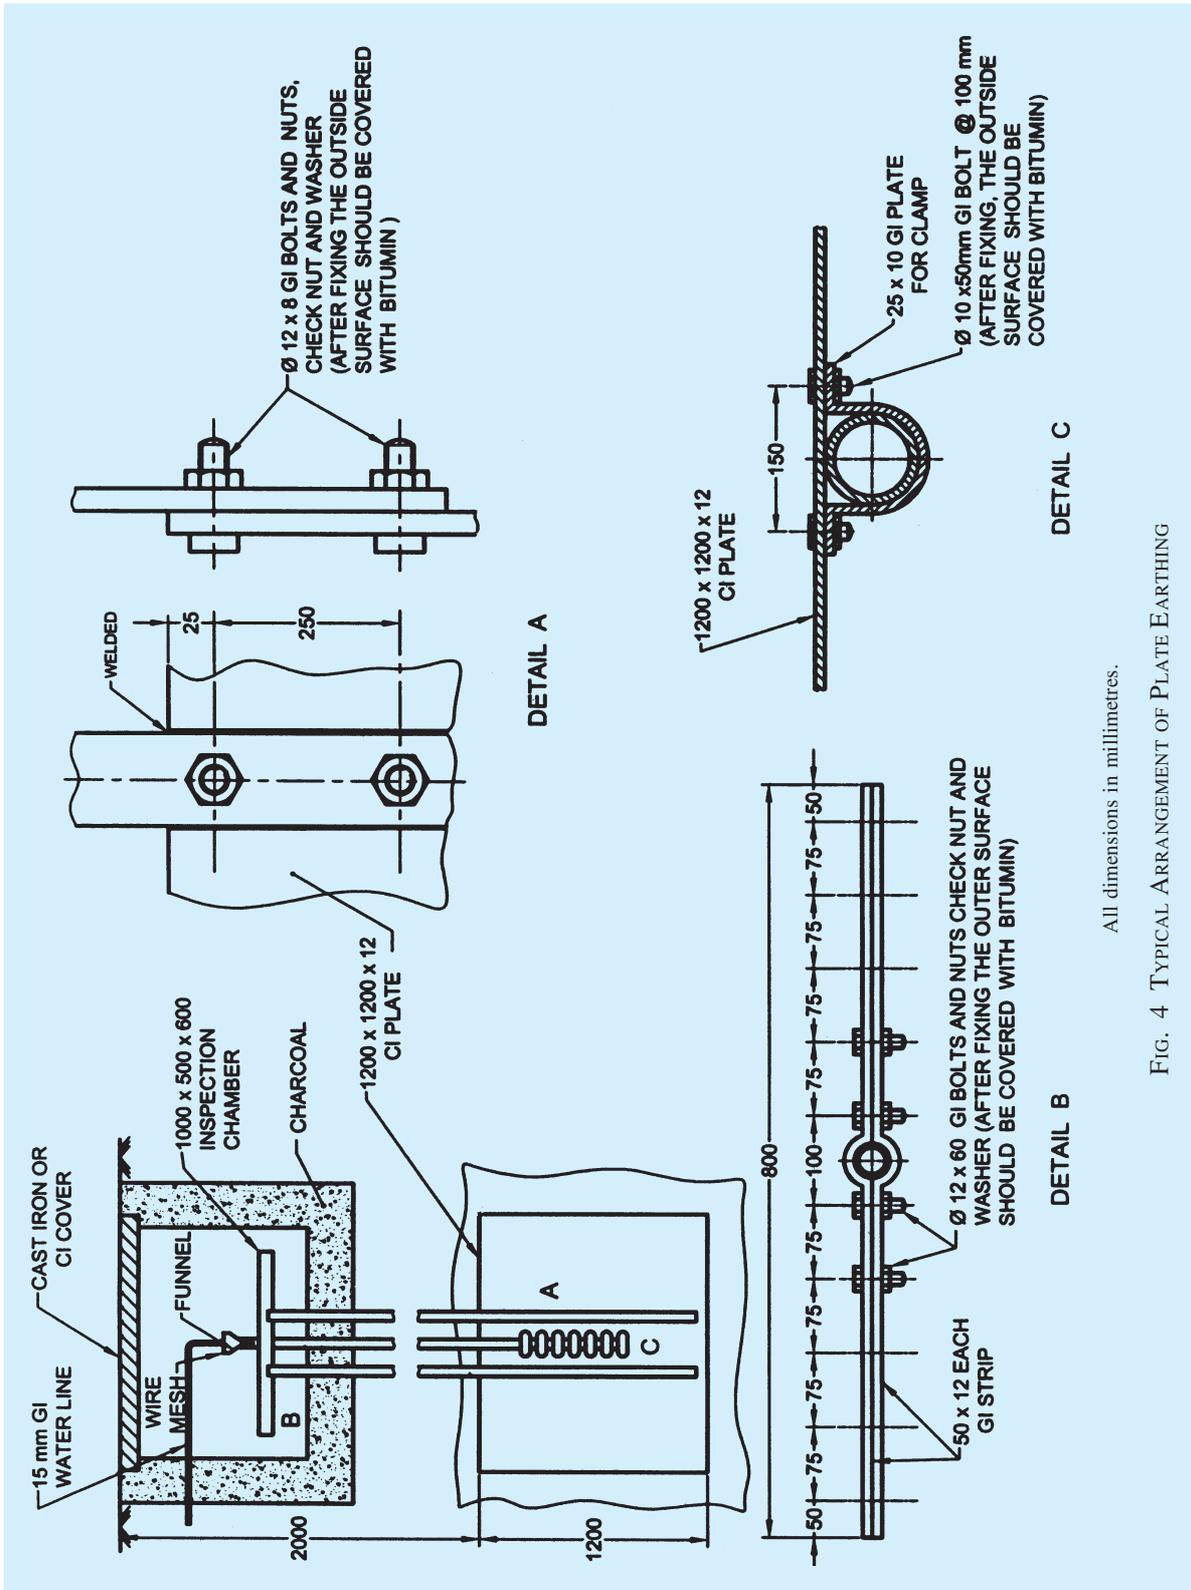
TYPICAL ARRANGEMENT OF PLATE EARTHING
